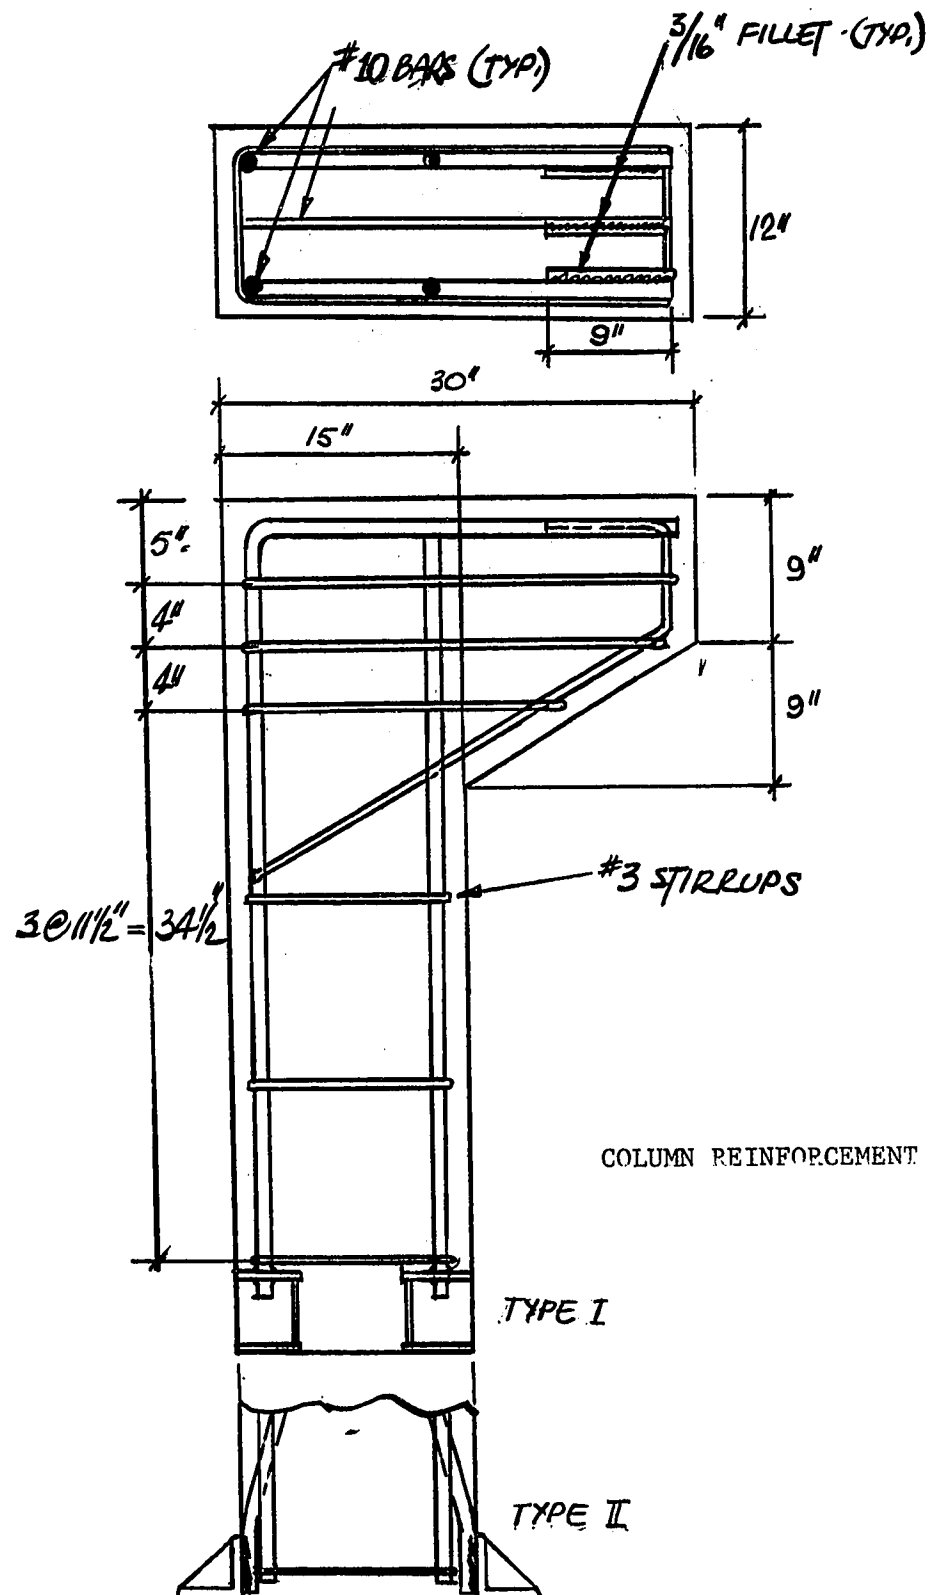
COLUMN-TO-BASE CONNECTION
